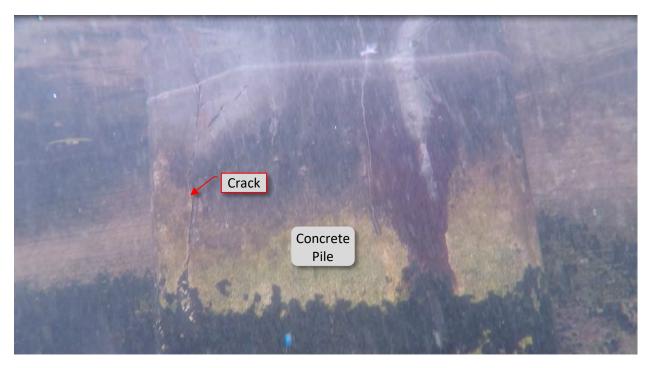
P28. STA 4+67. Crack at top of west flange with rust staining. Underwater view.
